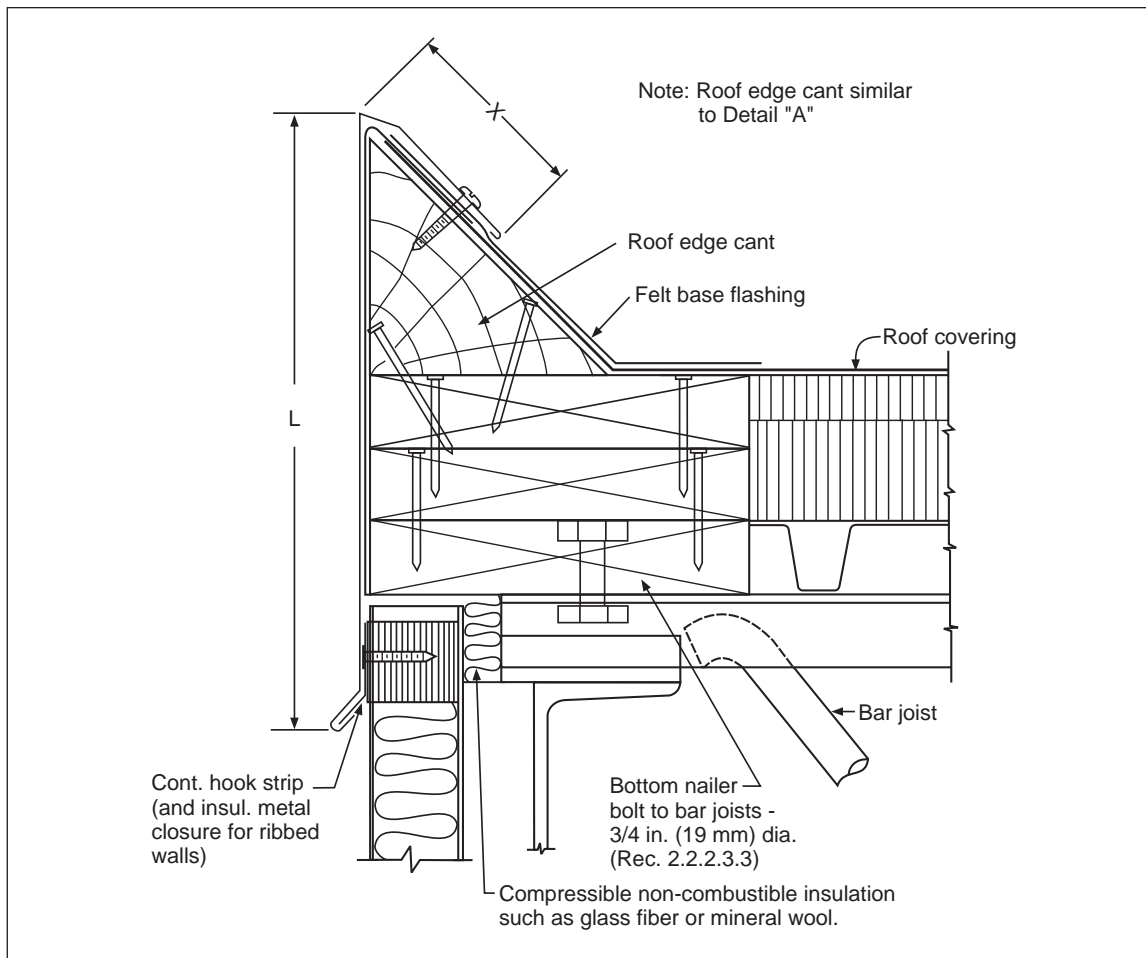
Multi-ply roof with panel wall with roof edge cant, nailer bolted to roof joists
